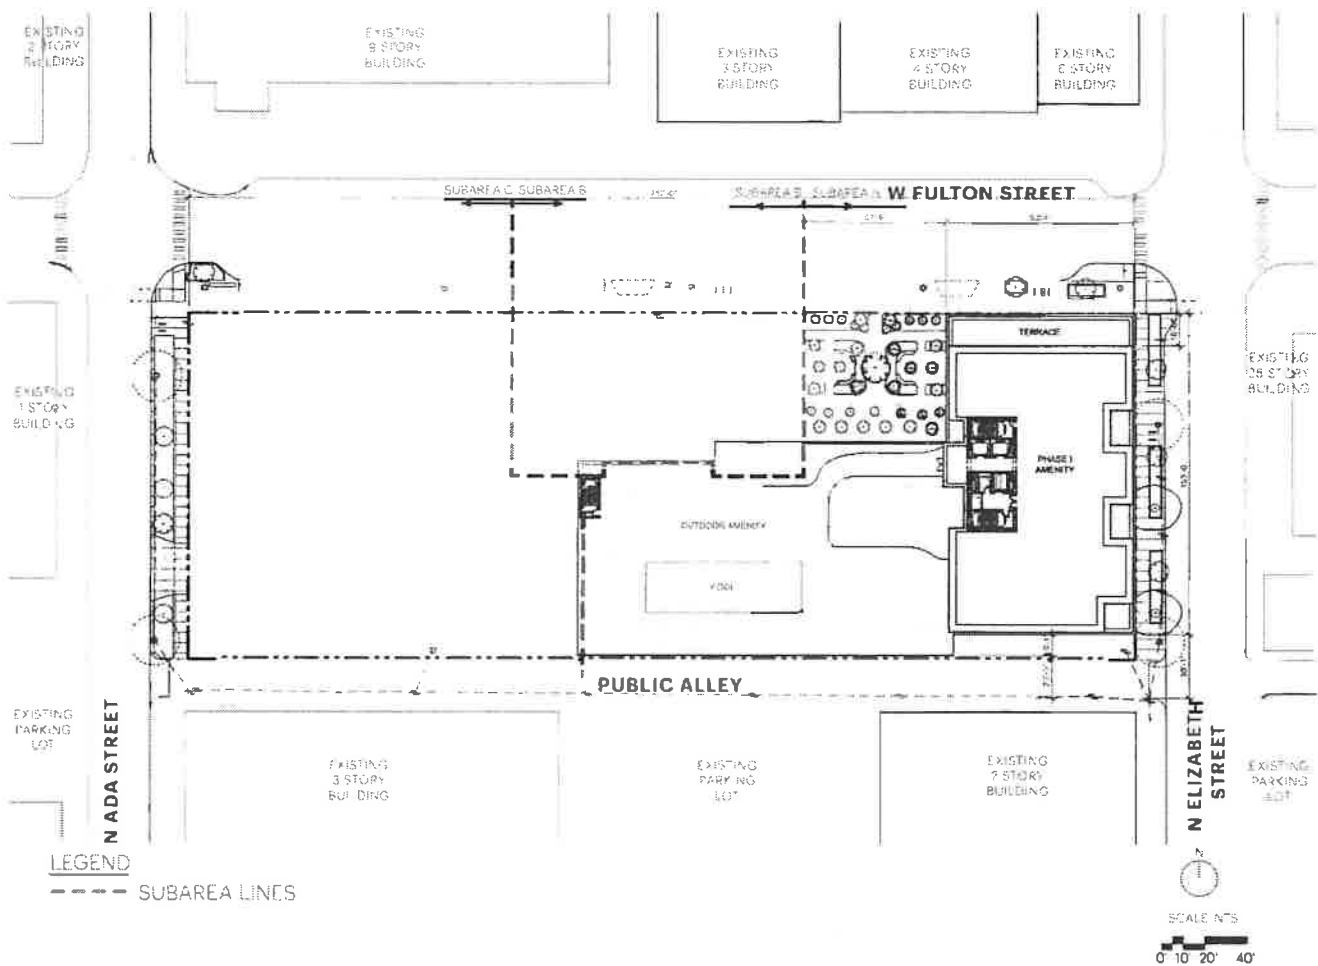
A: PODIUM ROOF PLAN (PHASE I INTERIM CONDITION)
